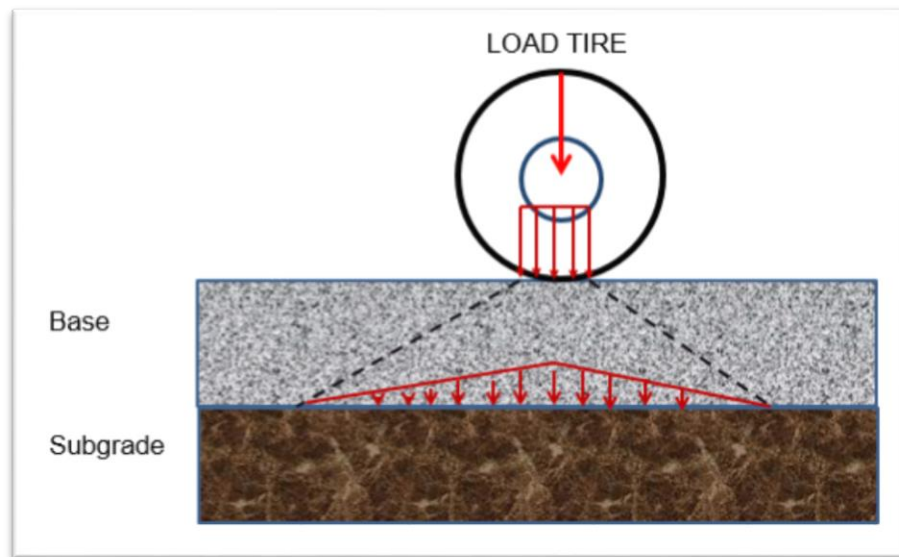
Load Distribution Pattern: Flexible Pavement Structure
